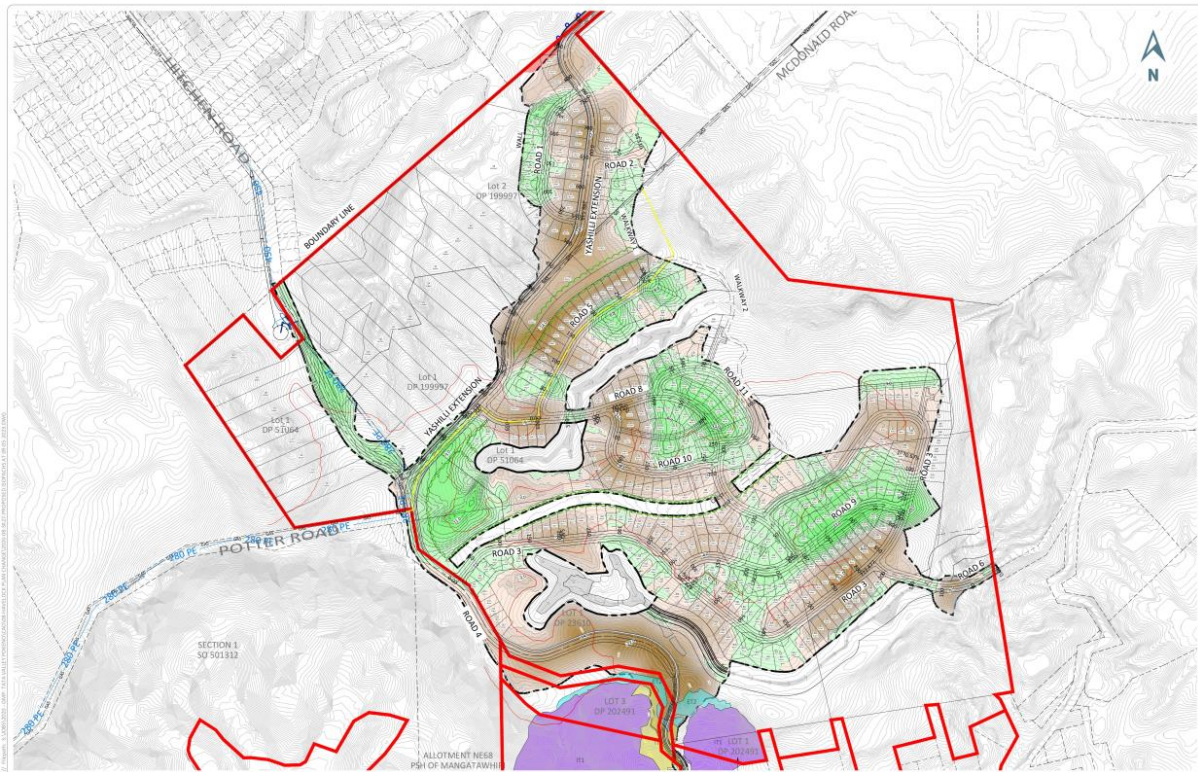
Pokeno South – Preliminary Earthworks (Drawing 2020-08-SK27-1)
